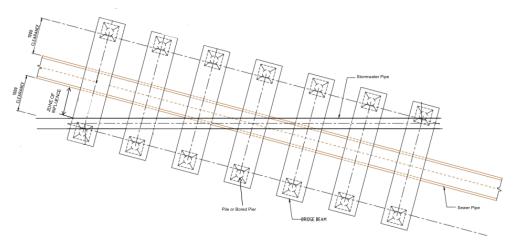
Piled Bridge Over Sewerage (Screw Pile or Bored Pier)
